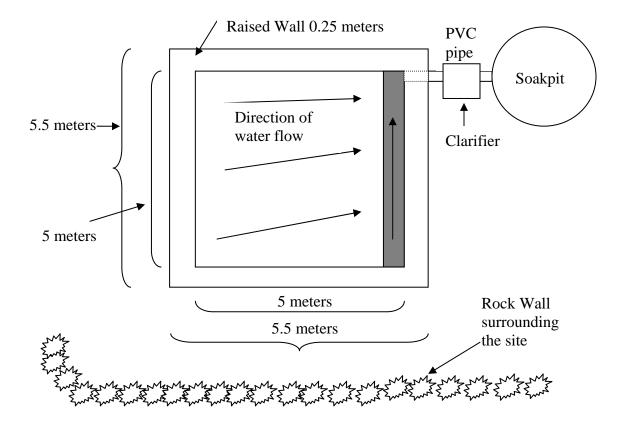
Wash Area and Soak Pit Design (Sokourani)
